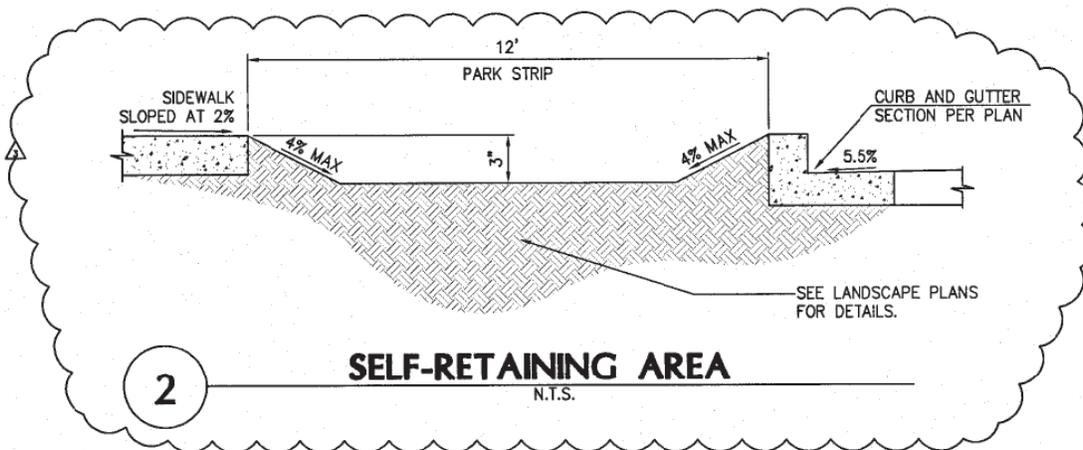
Example Self-Retaining Landscaped Area Cross Section
